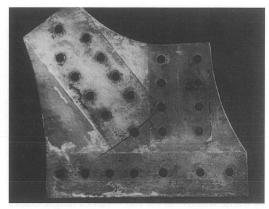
Crack in a gusset plate after millions of loading cycles
